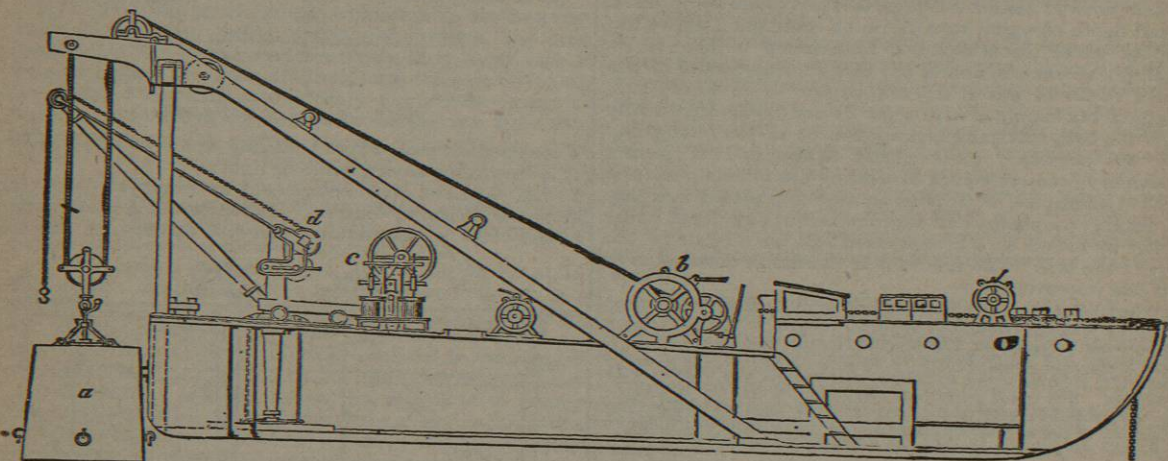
Longitudinal Section of Diving Bell Lighter (56 feet long and 24 feet beam).
